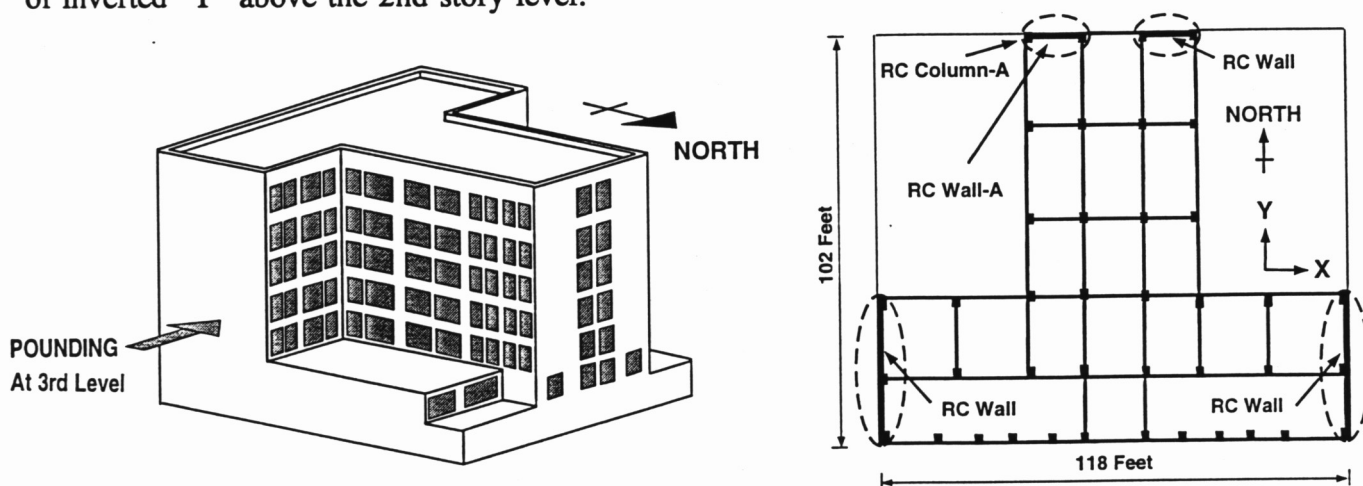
Isometric View and Typical Floor Framing Plan of 7-Story Building.
